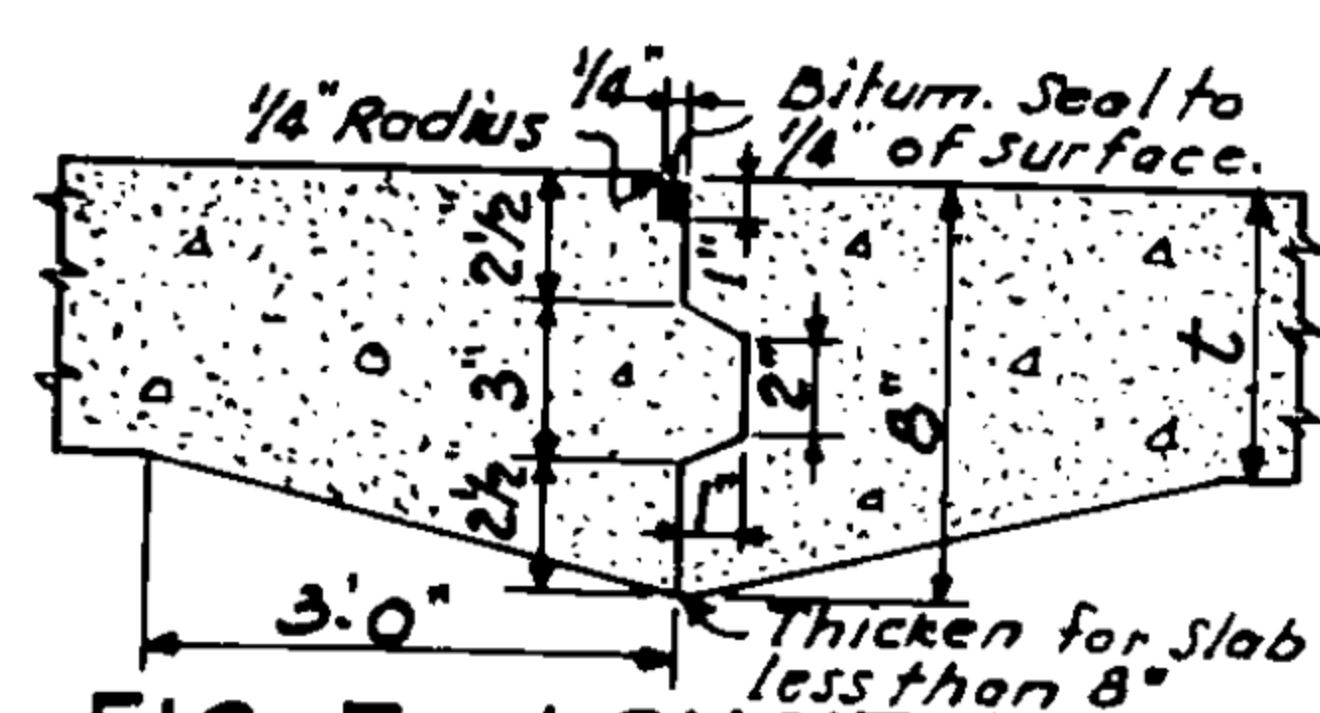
FIG. E - LONGITUDINAL CONSTRUCTION JOINT.
